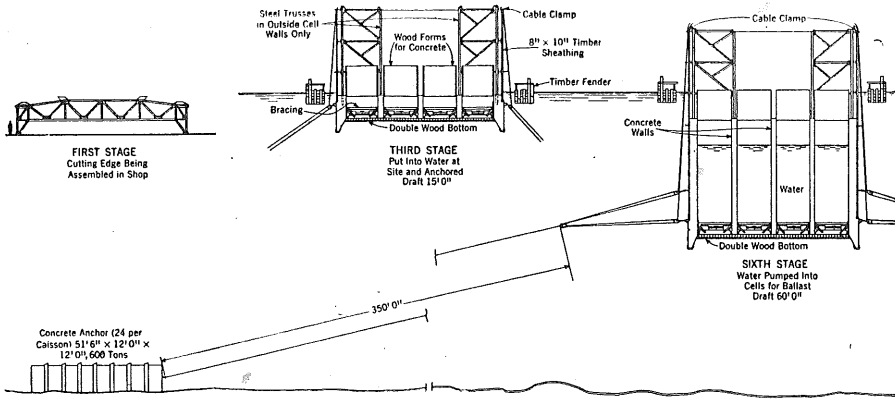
USE OF CONCRETE BLOCKS TO ANCHOR FLOATING CAISSONS.
